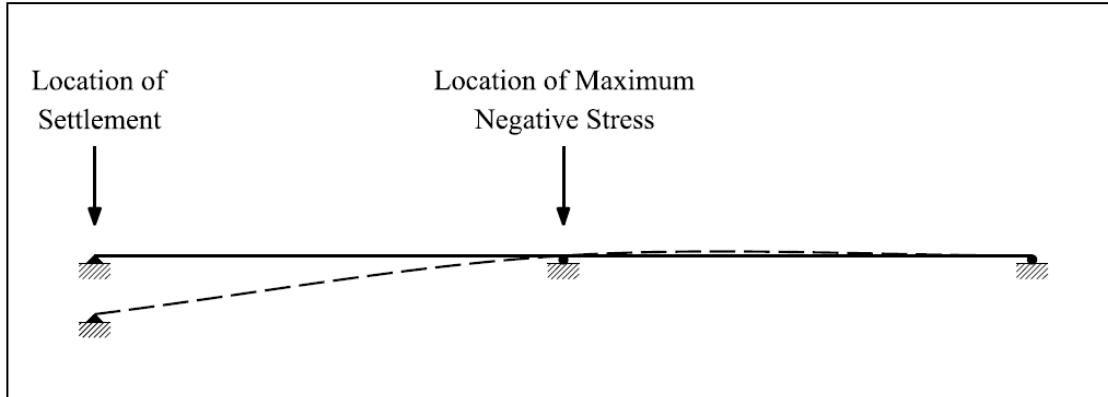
Exterior Support Settlement of a Two-Span Continuous Bridge
